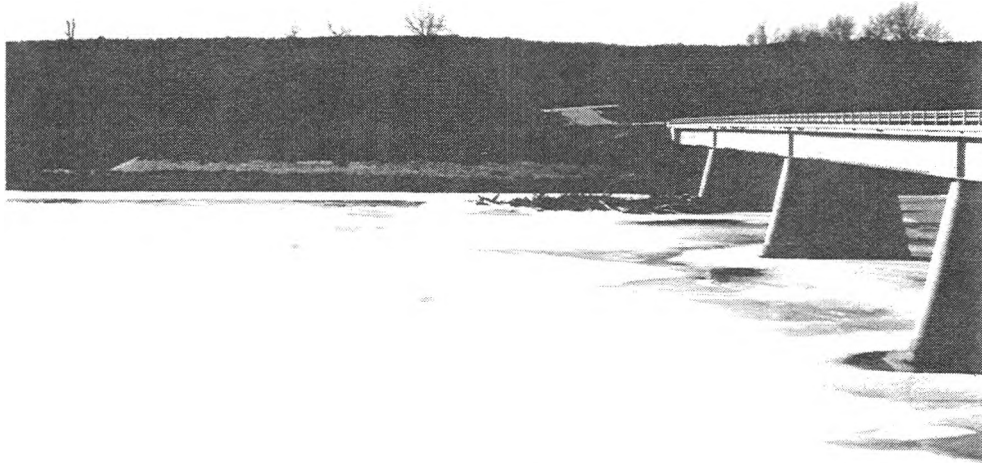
Blue Ridge Bridge, Whitecourt remote site. Photo from left upstream bank indicating excellent bank height. Bridge obstructs downstream line of sight. 26 March 1993.
